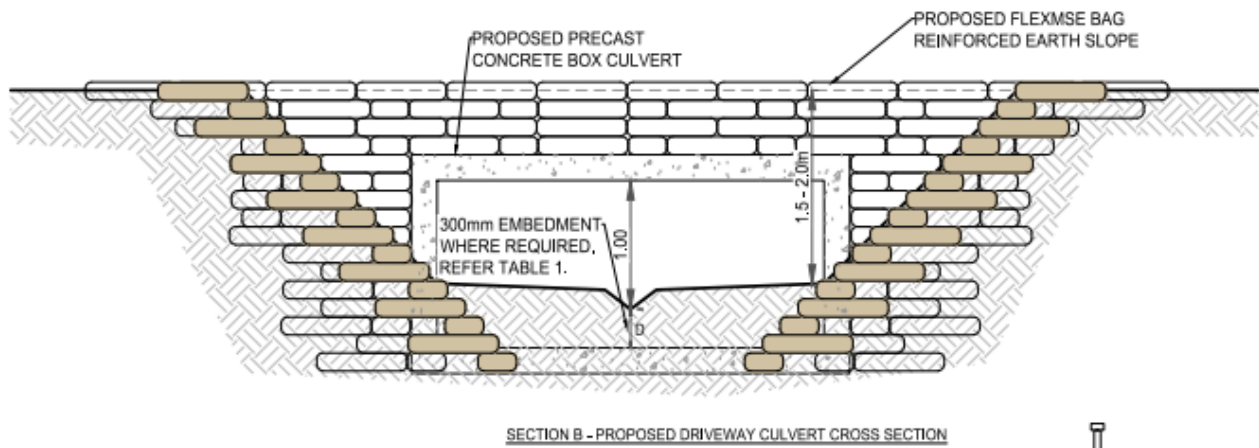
Cross-section of driveway culverts (Drawing N.007799.60 - Appendix B).
